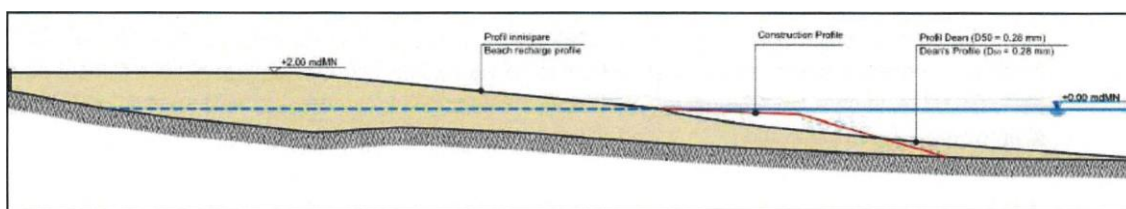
Transversal section through the sanded beach (adapted scale)
